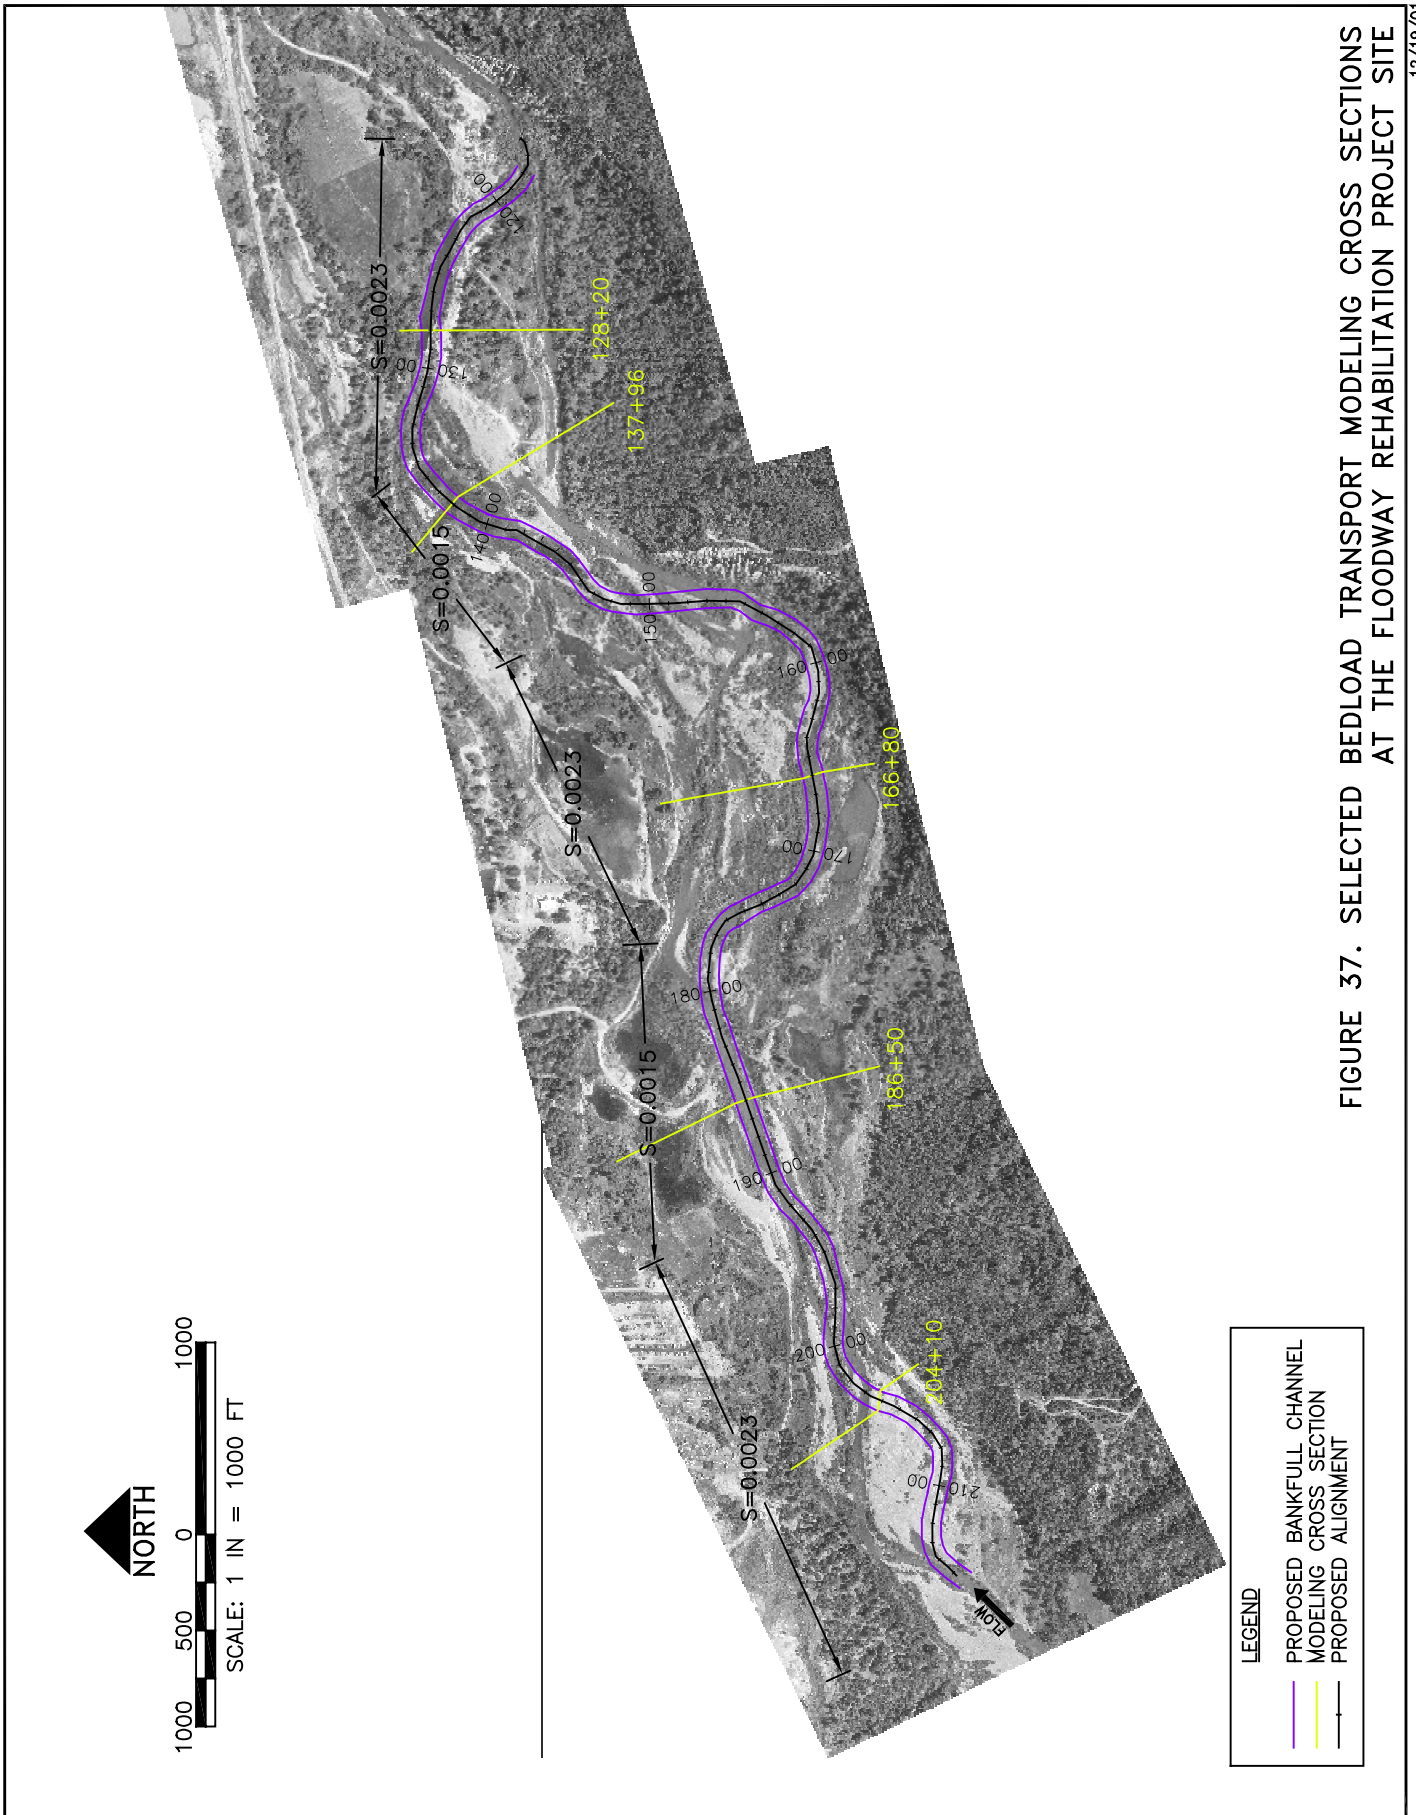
SELECTED BEDLOAD TRANSPORT MODELING CROSS SECTIONS
